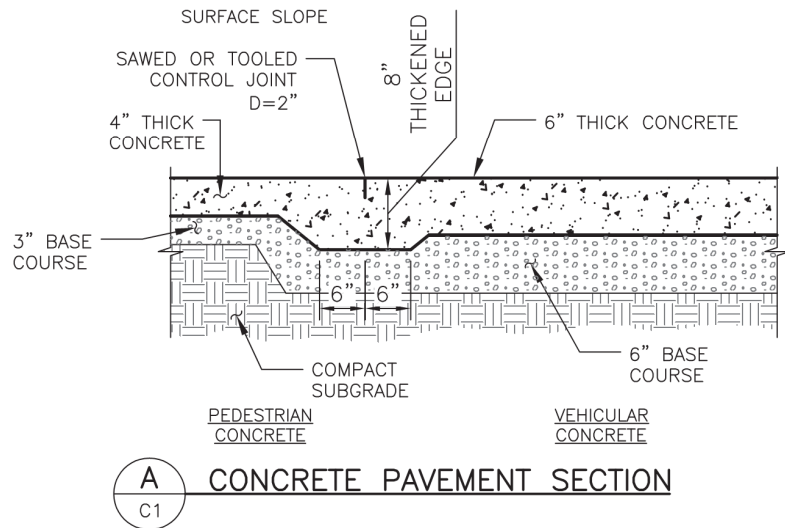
A section view showing poured-in-place concrete pavement construction.
